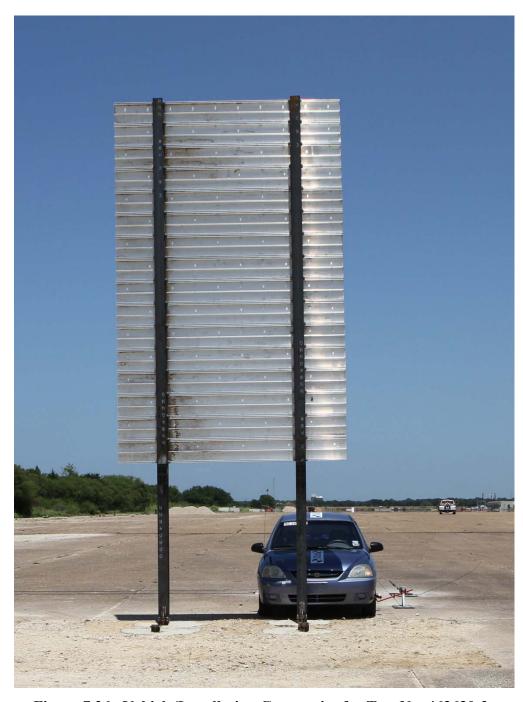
Vehicle/Installation Geometrics for Test No. 463630-2.
